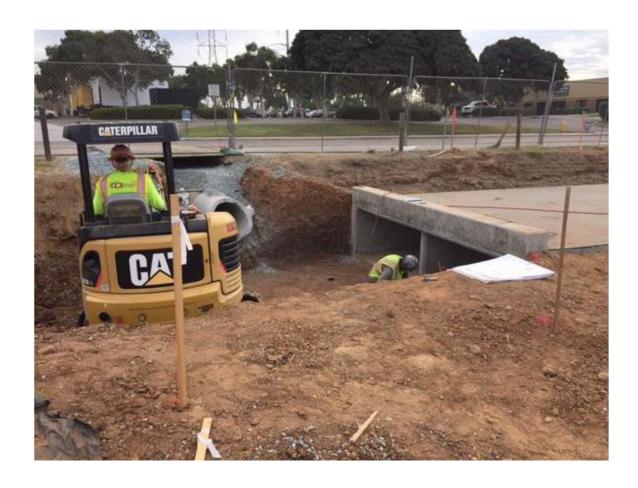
Continuing construction of the box culvert and excavation for the wing walls upstream of the box culvert at the Bay Boulevard Substation southern driveway site was observed this reporting period.
